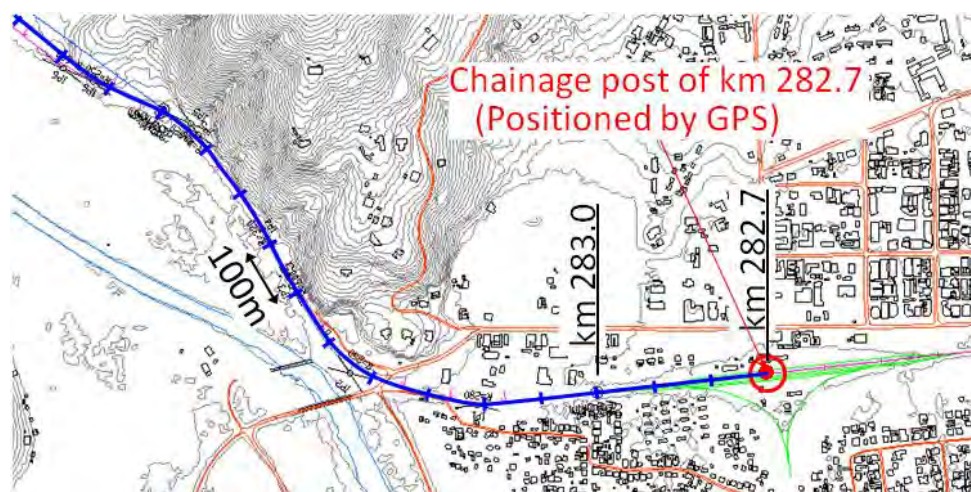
Proposed Section to be Implemented by the Yen Loan Project
